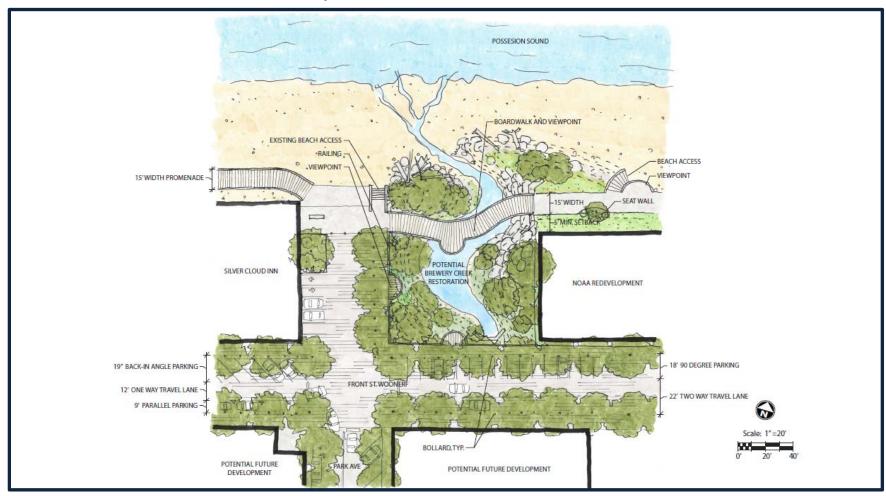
Brewery Creek Park and Woonerf Detail Plan
